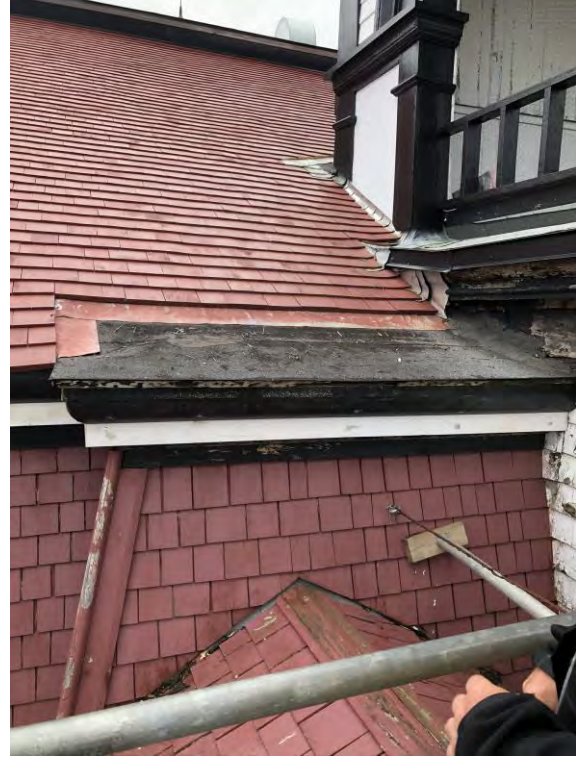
Existing asphalt layers not replaced by Lead Coated Copper flashing
